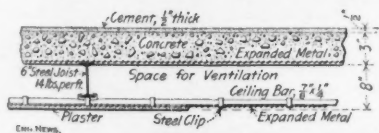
Section of Concrete and Expanded Metal Fireproof Floor Tested by the British Fire Prevention Committee.
